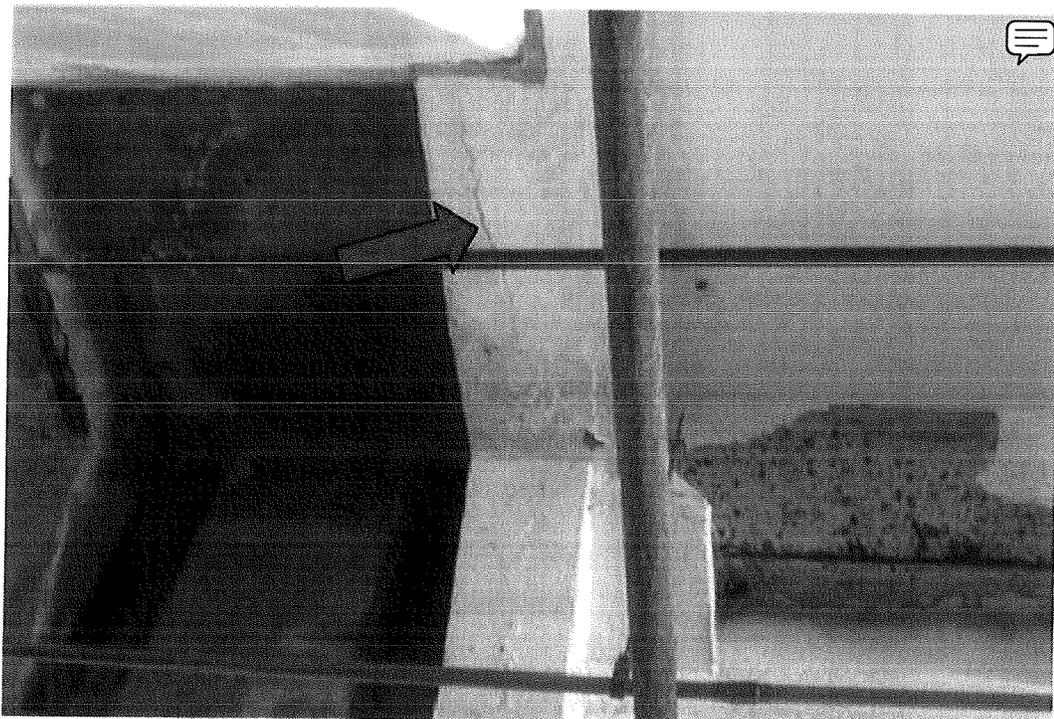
Cracked and hollow sounding encasement. Underside of Parking Level 6, at Column Line U6 along Column Line 27. (Approx. 4 SF)
